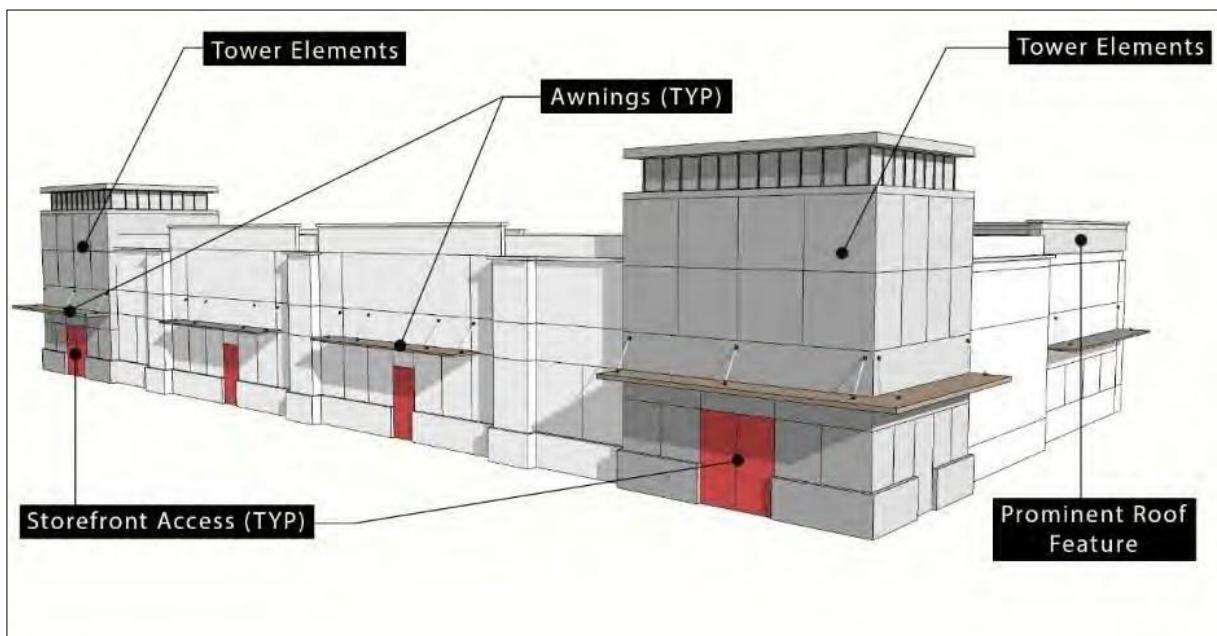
Front and side facades of the building with tower elements, awnings, storefront access, and prominent roof features.
